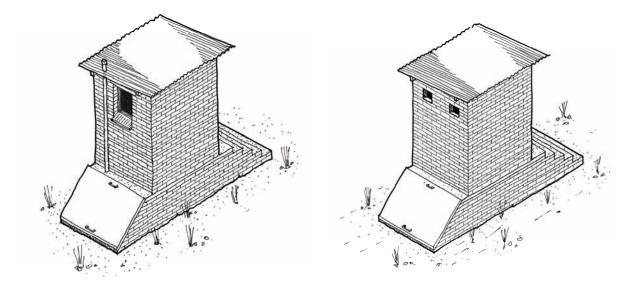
Typical examples of simple, easy to build UD toilet structures. As an alternative to conventionally built brick structures, some commercially available toilets are built with thin prefabricated concrete panels that are assembled on site (Drawings: MC Bolton).
